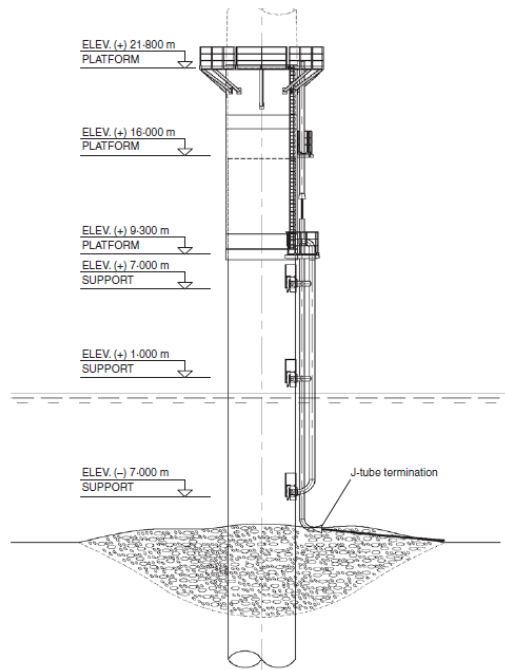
Detailed section of a foundation installed in North Hoyle. Carter et al. (2007)
